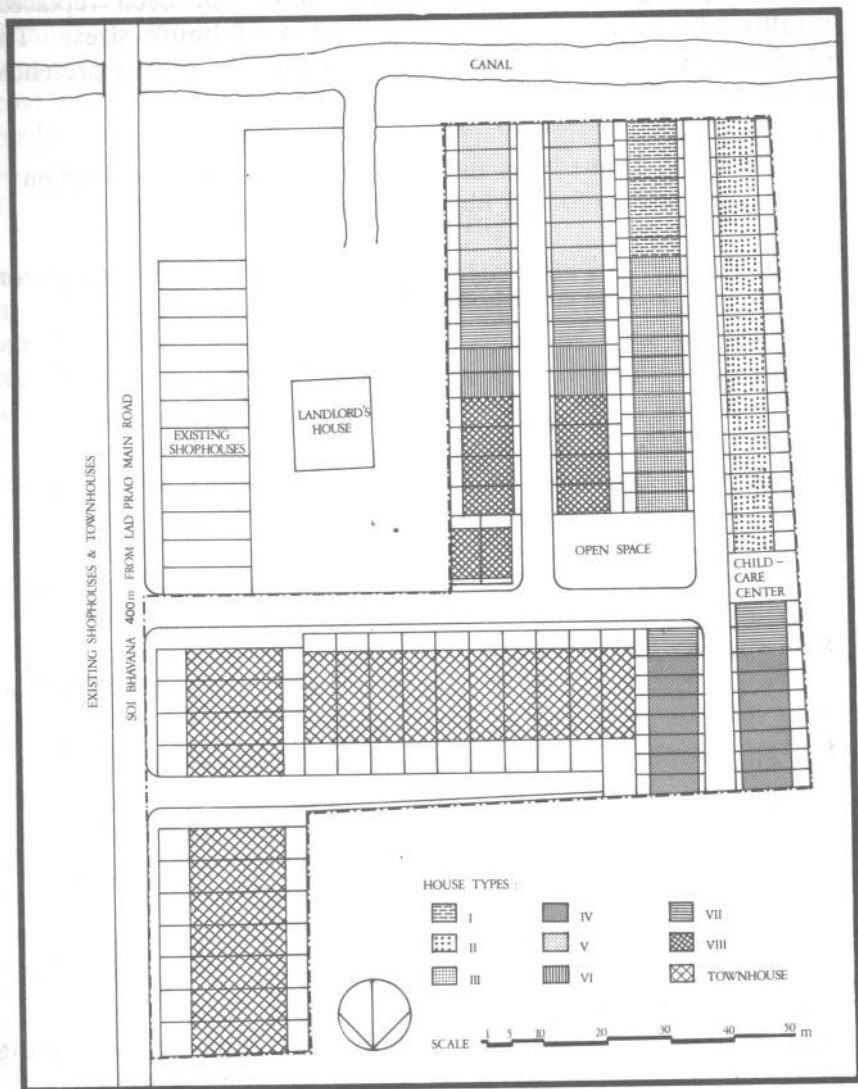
Plan of the Soi Bhavana slum reconstruction project, Bangkok, 1981
